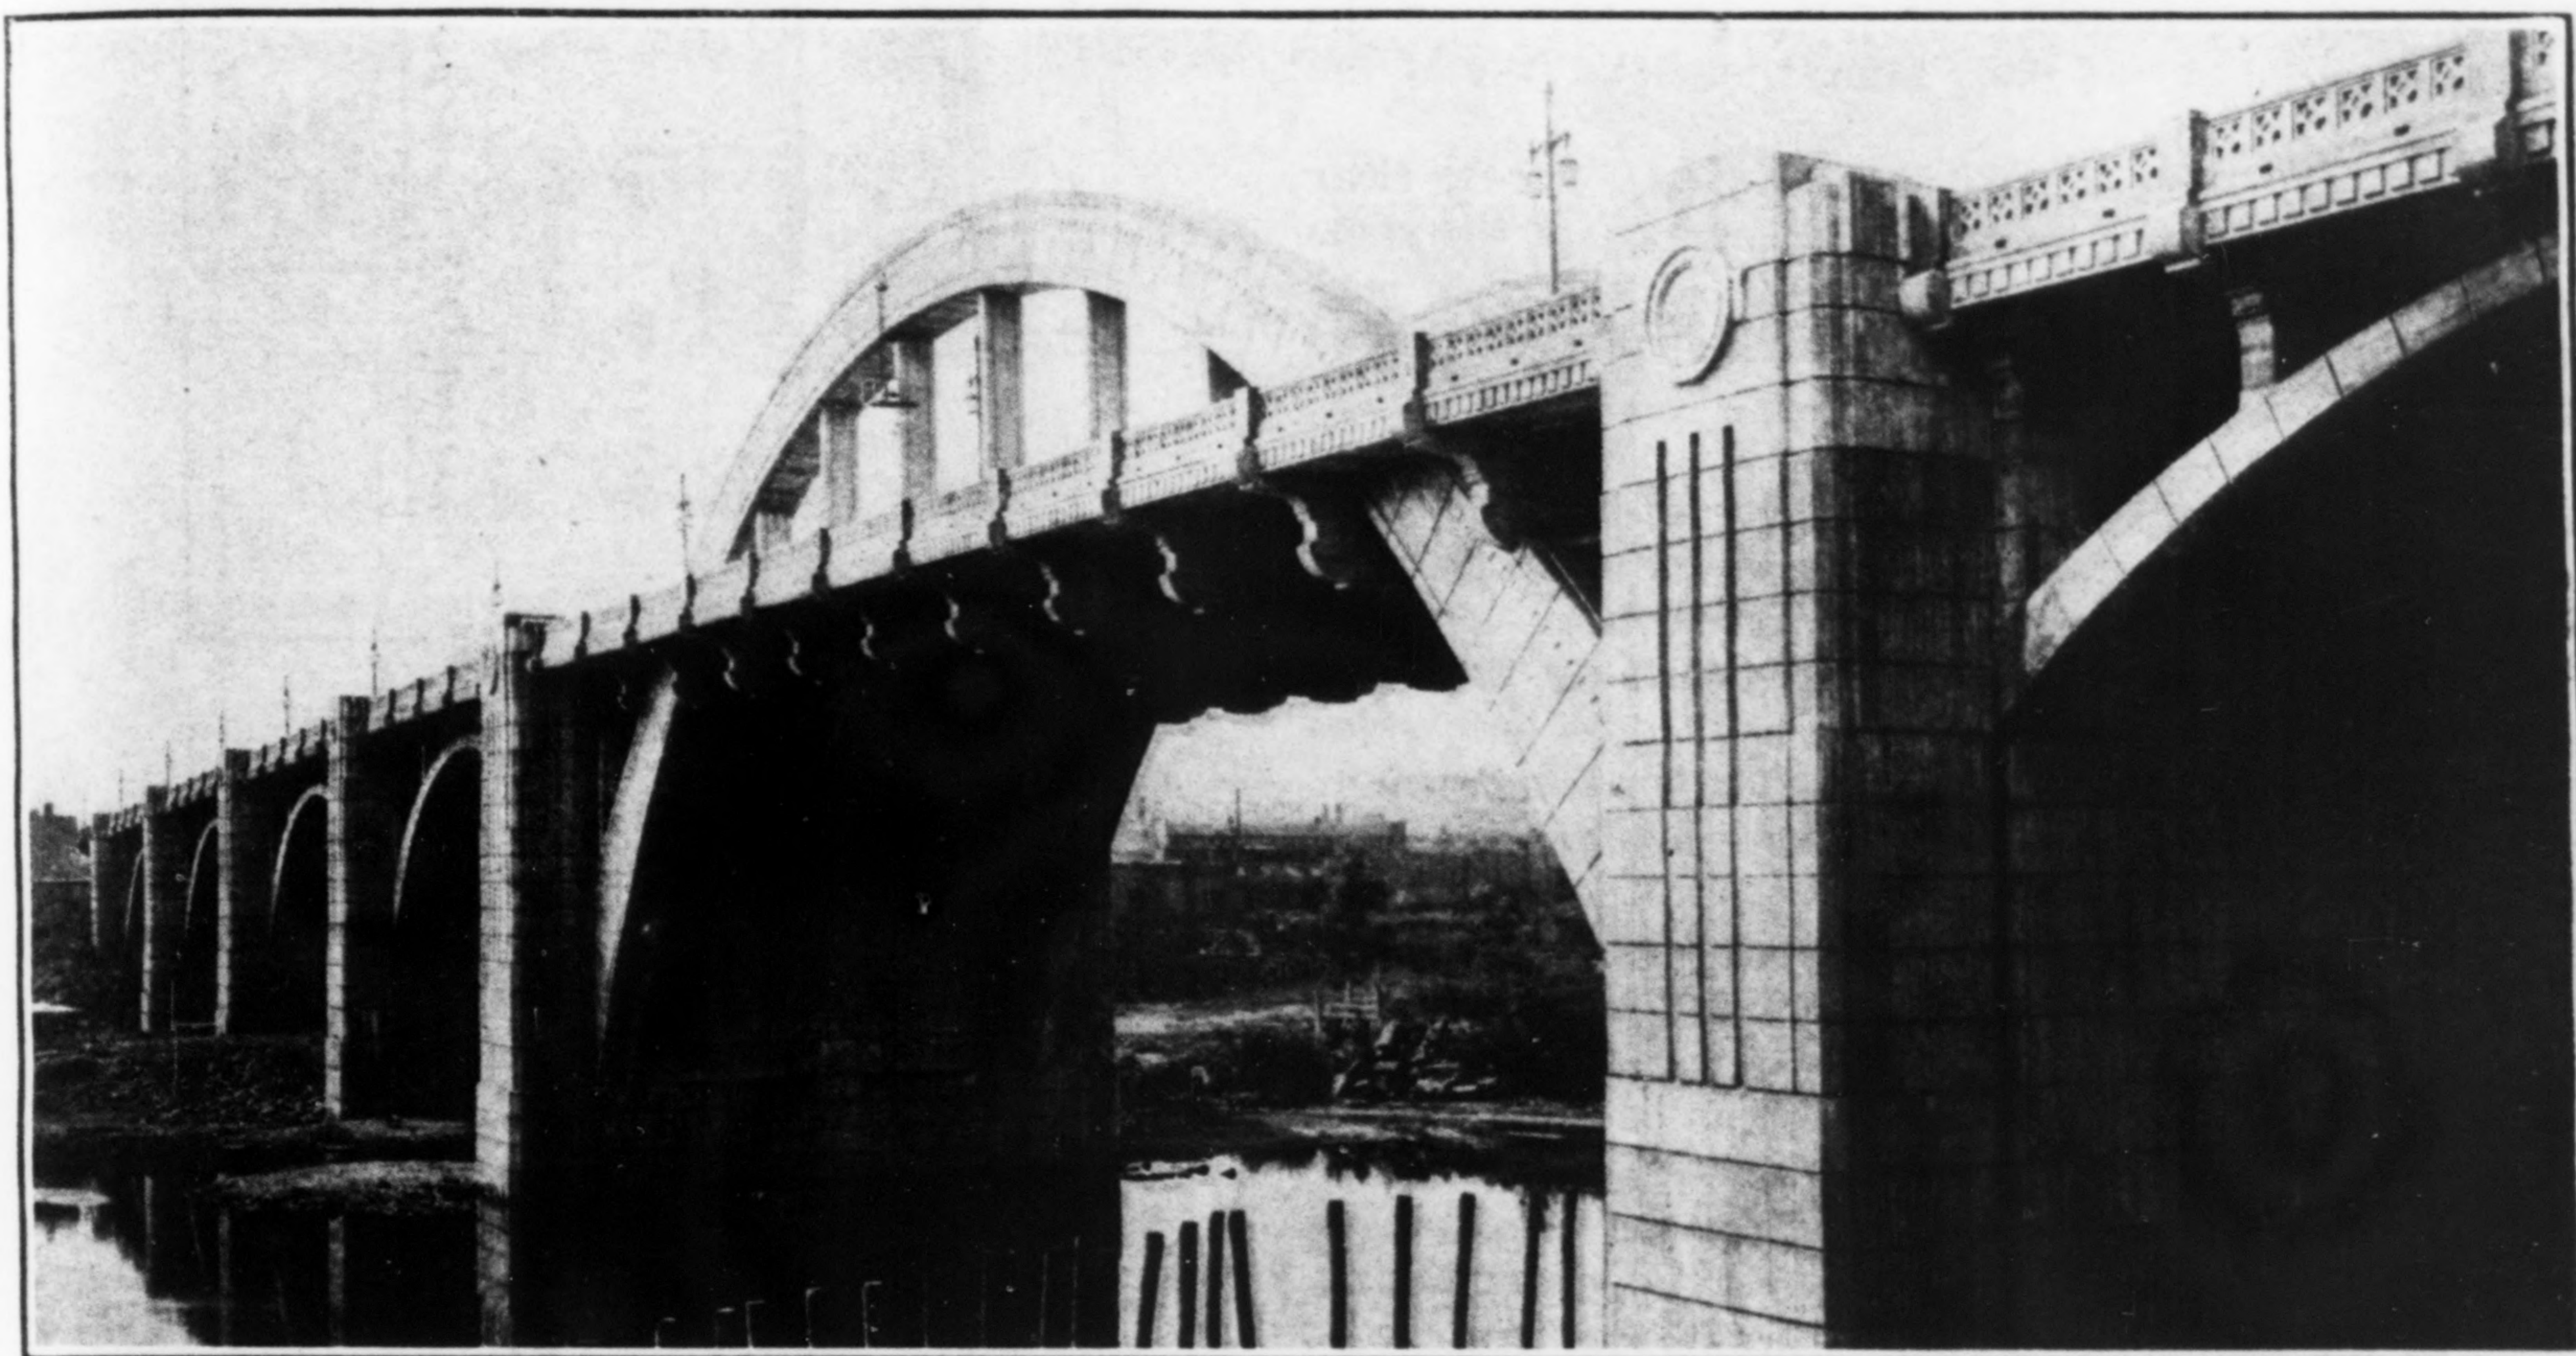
LOOKING ALONG THE COMPLETED ROBERT ST. BRIDGE, ST. PAUL, MINN.
